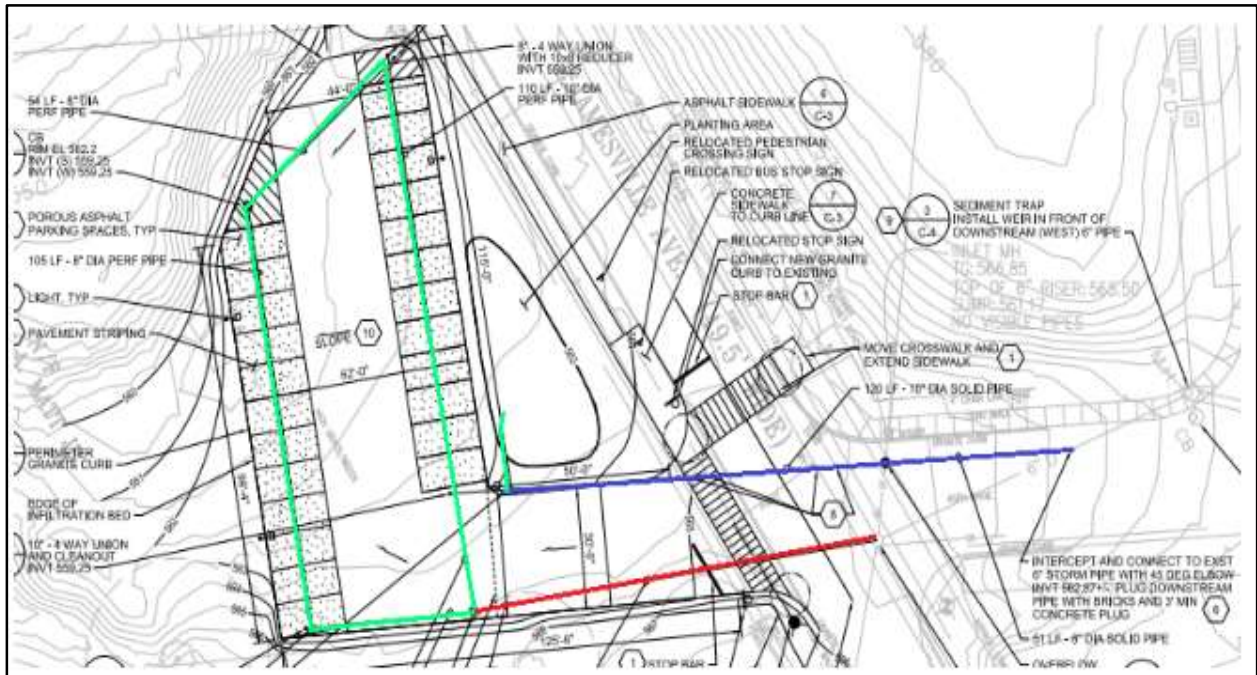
Plan View for Hughes Magnet School Parking Lot Permeable Pavement
